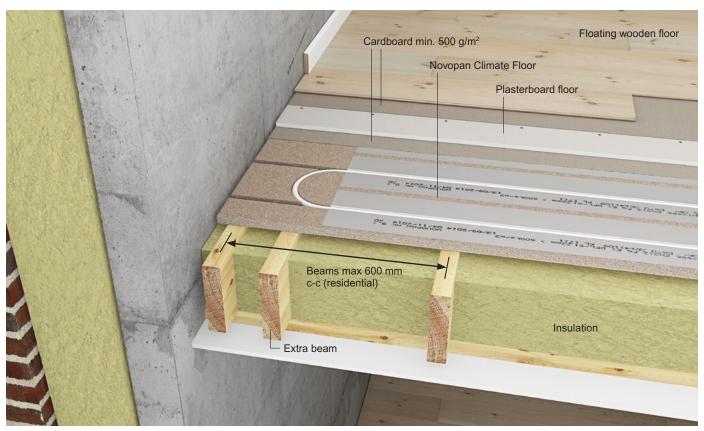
Novopan Climate Floor laid floating on a wooden deck and finished with a floating wooden floor. An additional beam is added to support the turning grooves.
